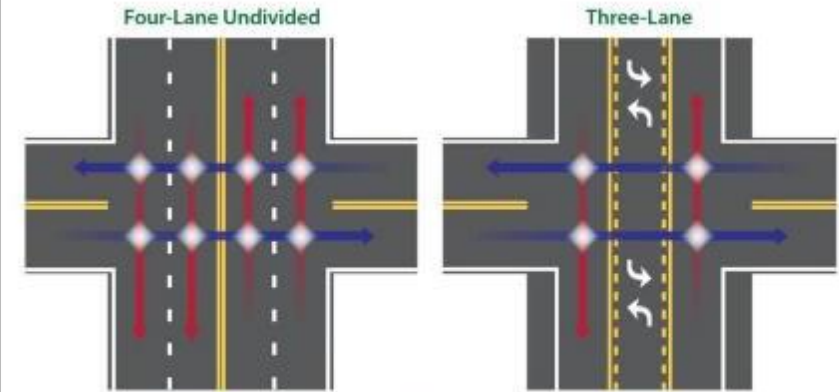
Crossing and Through Traffic Conflict Points at Intersections for a Four-Lane Undivided Roadway and a Three-Lane Cross Section (Adapted from Weib, 1999)
